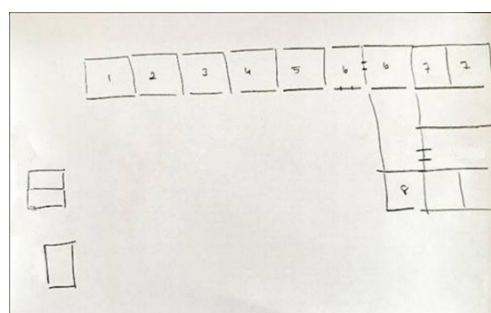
Veli Bağ House Floor Plan Sketch (Interviewee 4)
